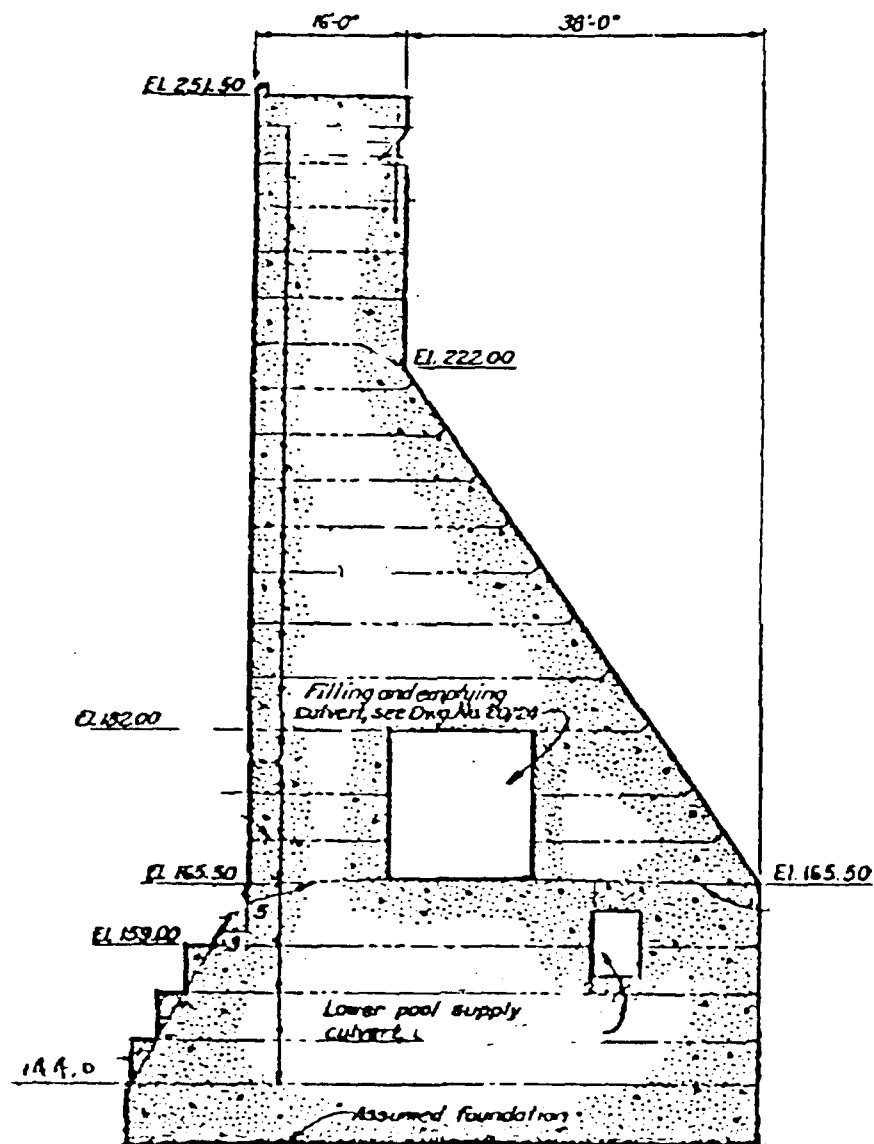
Typical cross section of chamber wall monolith on the south side at Eisenhower Lock
